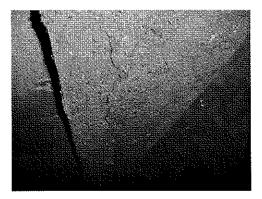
Overall Photo of Chamber Roof Behind Tide Gates: Approximately half of the ceiling surface is spalled. The remaining surface exhibits staining and shadows of the embedded steel sections contained within the concrete. The staining could indicate active corrosion of the embedded steel sections.
